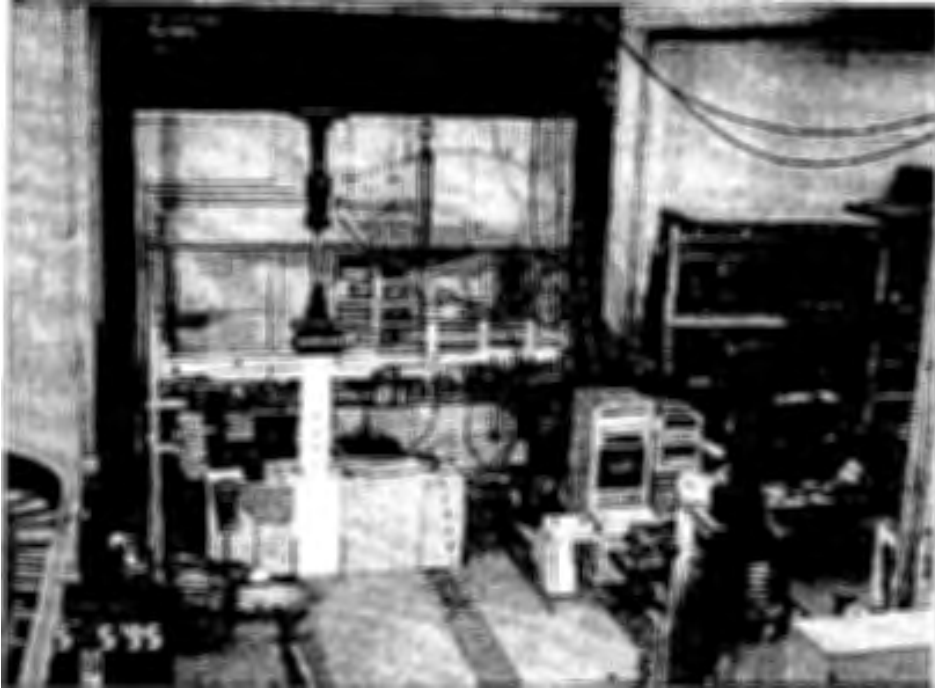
View of Test Set-Up Prior to Attaching Out-of-Plane Support System
